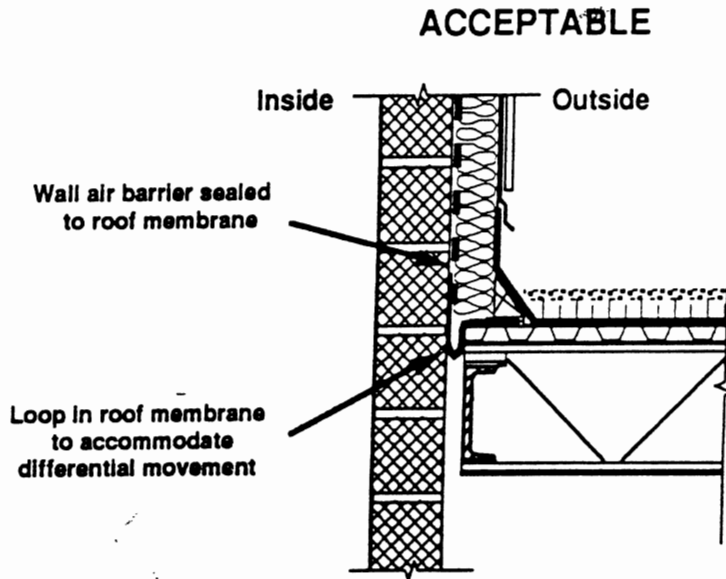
Masonry Setback Wall/Roof Connection - Steel Frame (Turenne)
